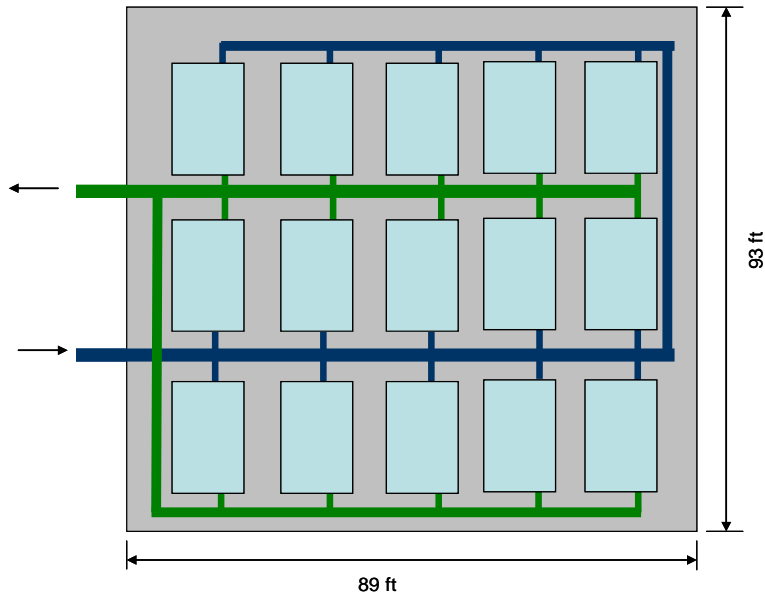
Example chiller layout and piping on Poe Reach (Not to Scale)
